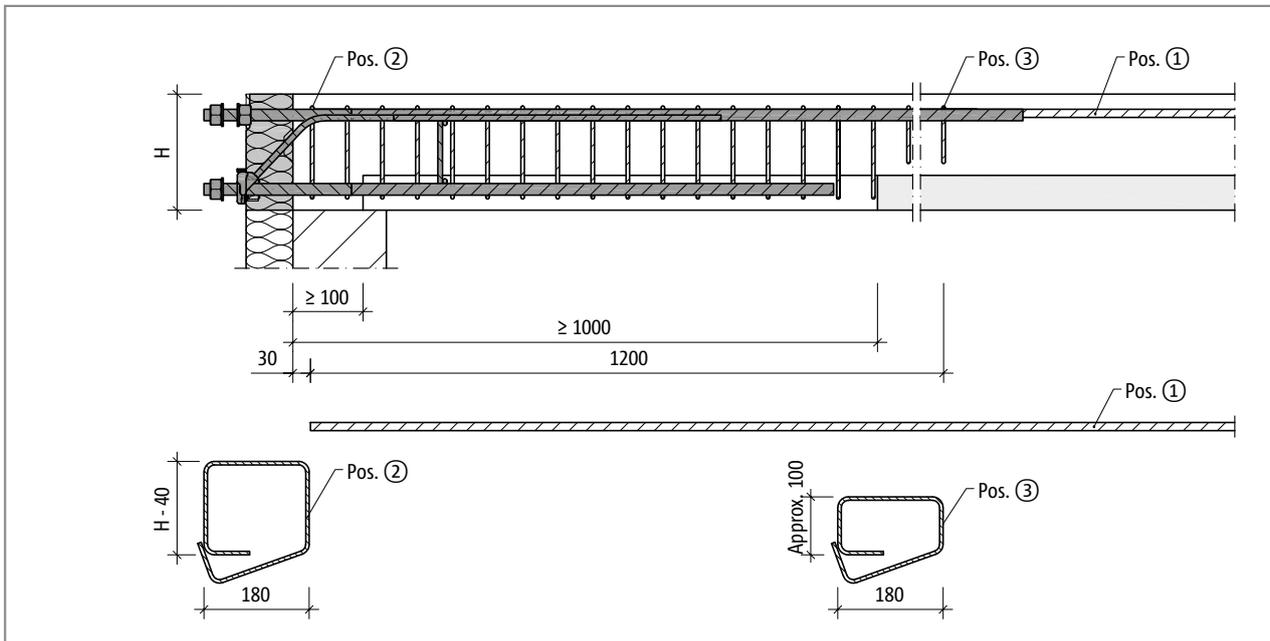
Schöck Isokorb® T type SK-MM2: On-site reinforcement with stirrup \varnothing 6 mm for semi-precaster construction; cross-section
